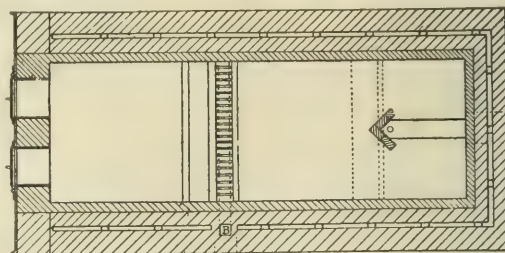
HORIZONTAL SECTION THROUGH BOILER SETTING
